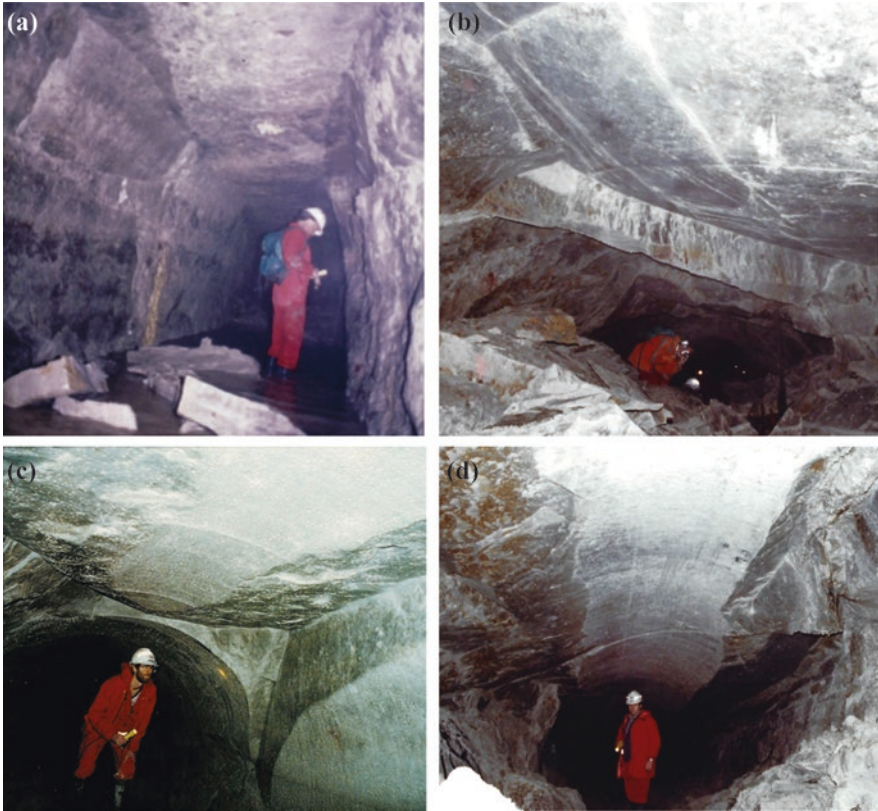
(a, b) Joint and bedding plane controlled overbreak in Terlingham Tunnel and in Beaumont Tunnel. Some of the 2.2 m diameter tunnel can be seen in the background in (b). (c) The wedge fall-out in Beaumont Tunnel is joint controlled, as experienced at various scales in the MST and MRT tunnels, especially along ch. 20–24 km. (d) The effect of a local increase in depth of cover when passing under the 70 m high Shakespeare cliffs
